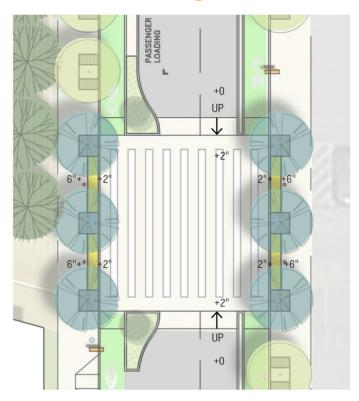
6: Raised Crosswalk at Lee Avenue and Reservoir Park
